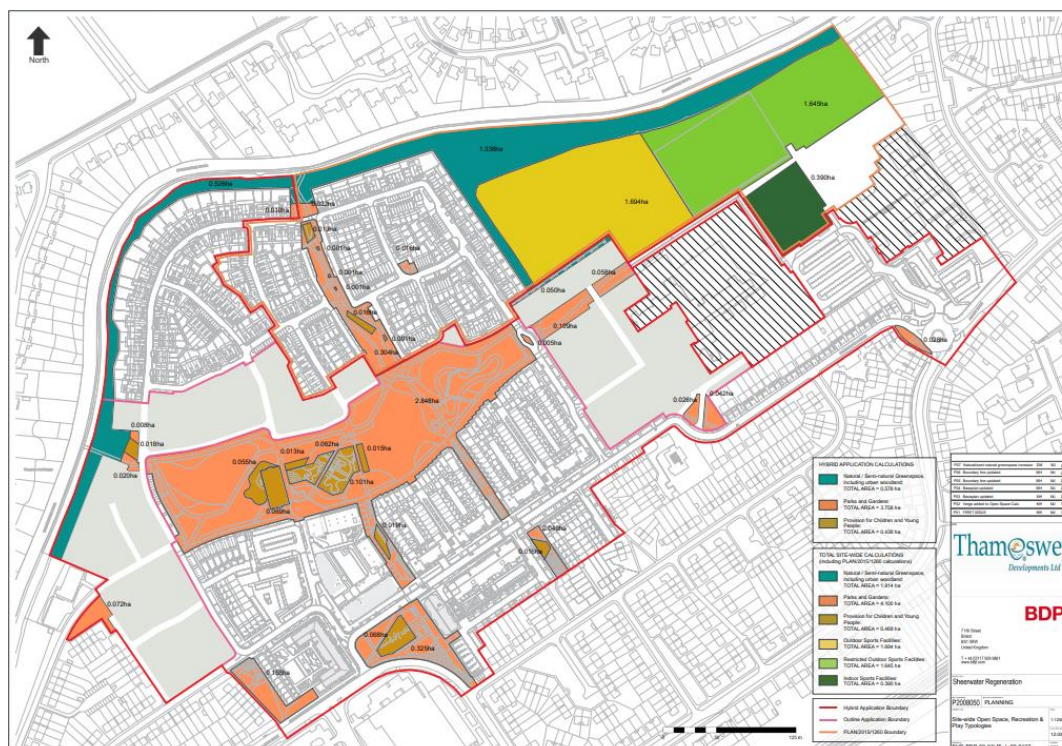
Open space proposals for the Sheerwater Regeneration Scheme. Source: planning application ref: PLAN/2018/0337, submitted by Thameswey Development Ltd, 2018.
